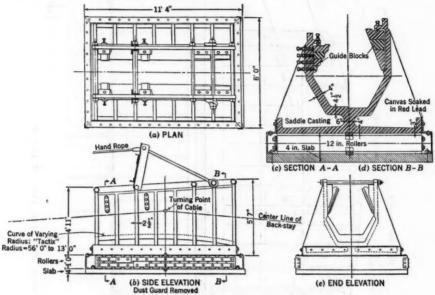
DETAILS OF ANCHORAGE CABLE SADDLE.
